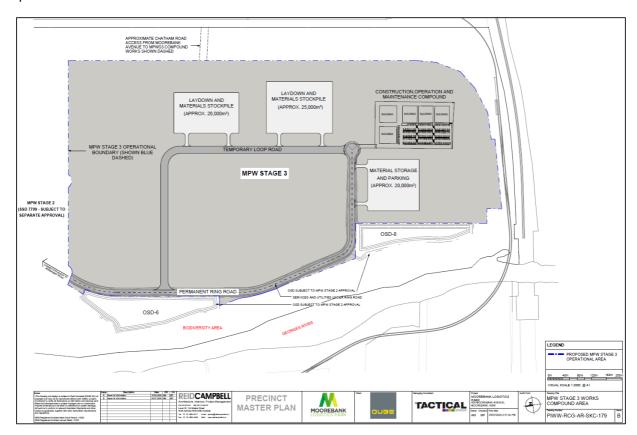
| Proposed MPW Stage 3 temporary works compound area (Source: Applicant's RtS)
